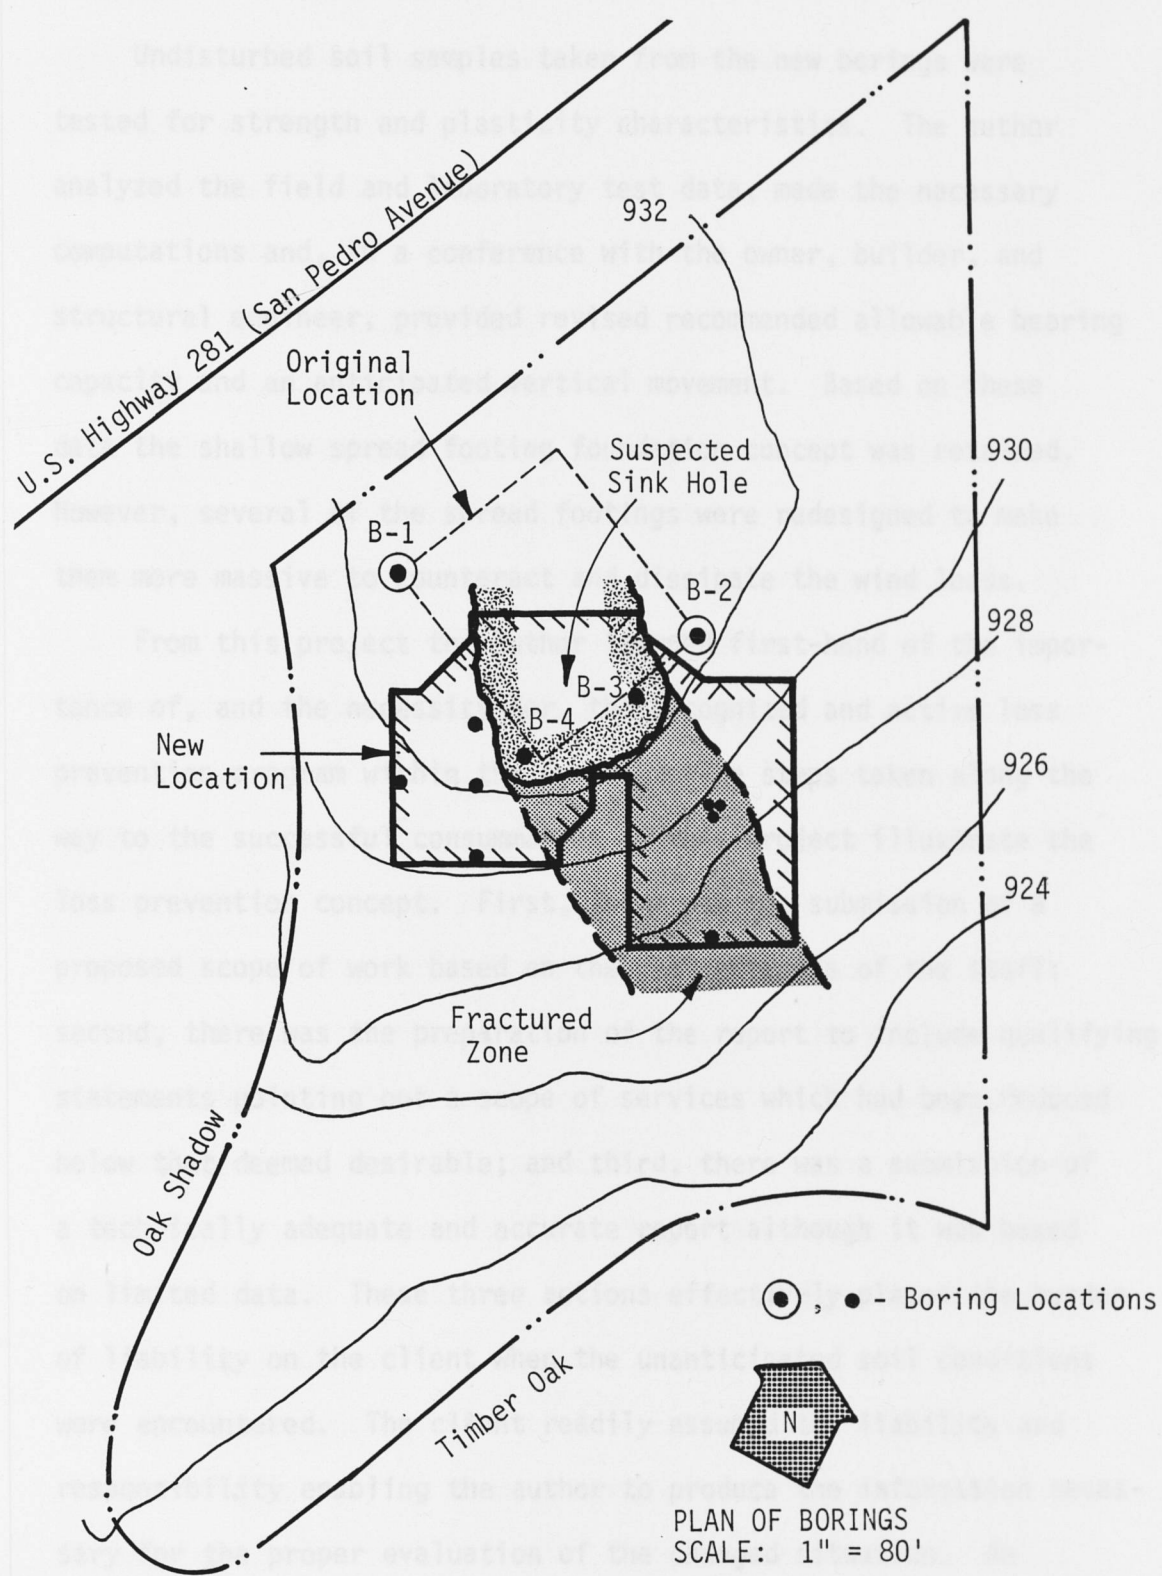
THE REGENCY GARDEN OFFICE BUILDING SITE LAYOUT
